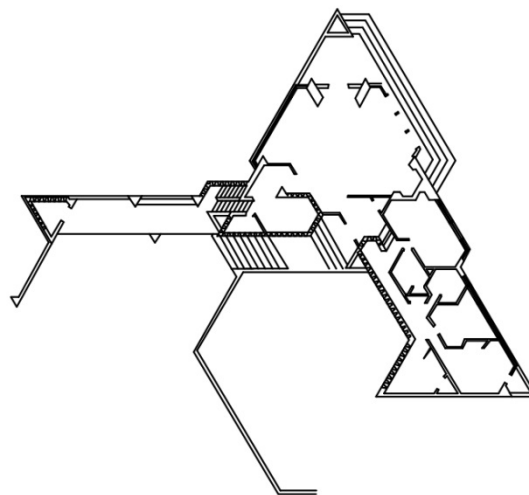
Palmer House Plan, redrawn from Storrer (1993: 352)
